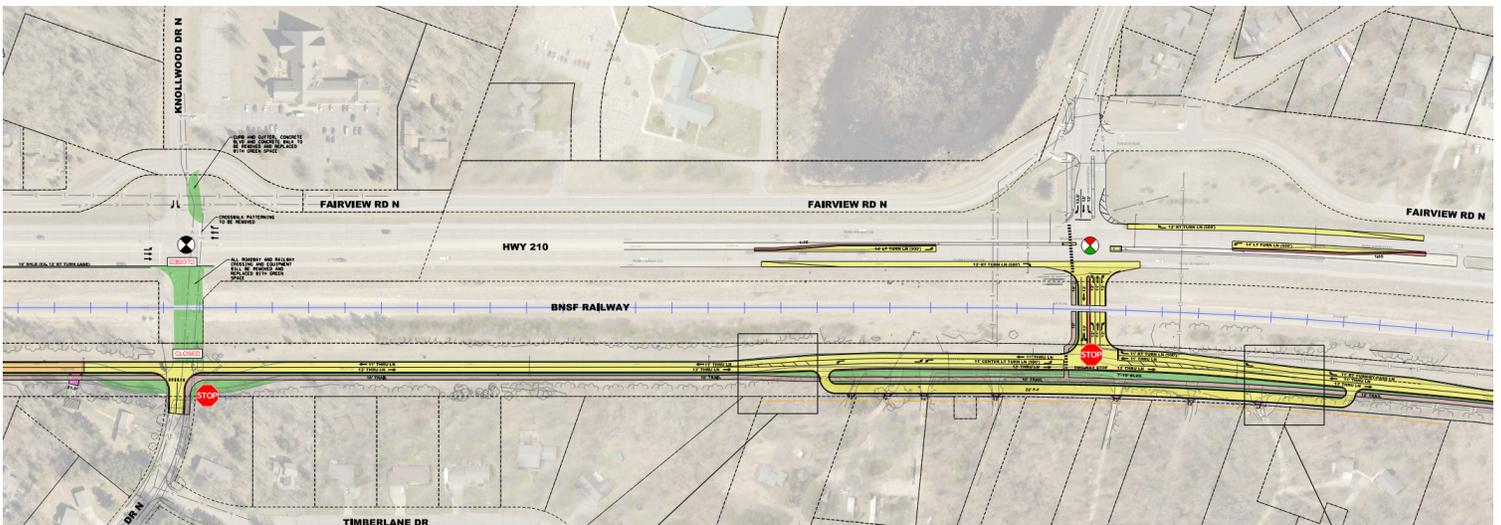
Plan View of Proposed Project. Closure of the South Leg on Knollwood Drive with a replacement at Inglewood Drive
